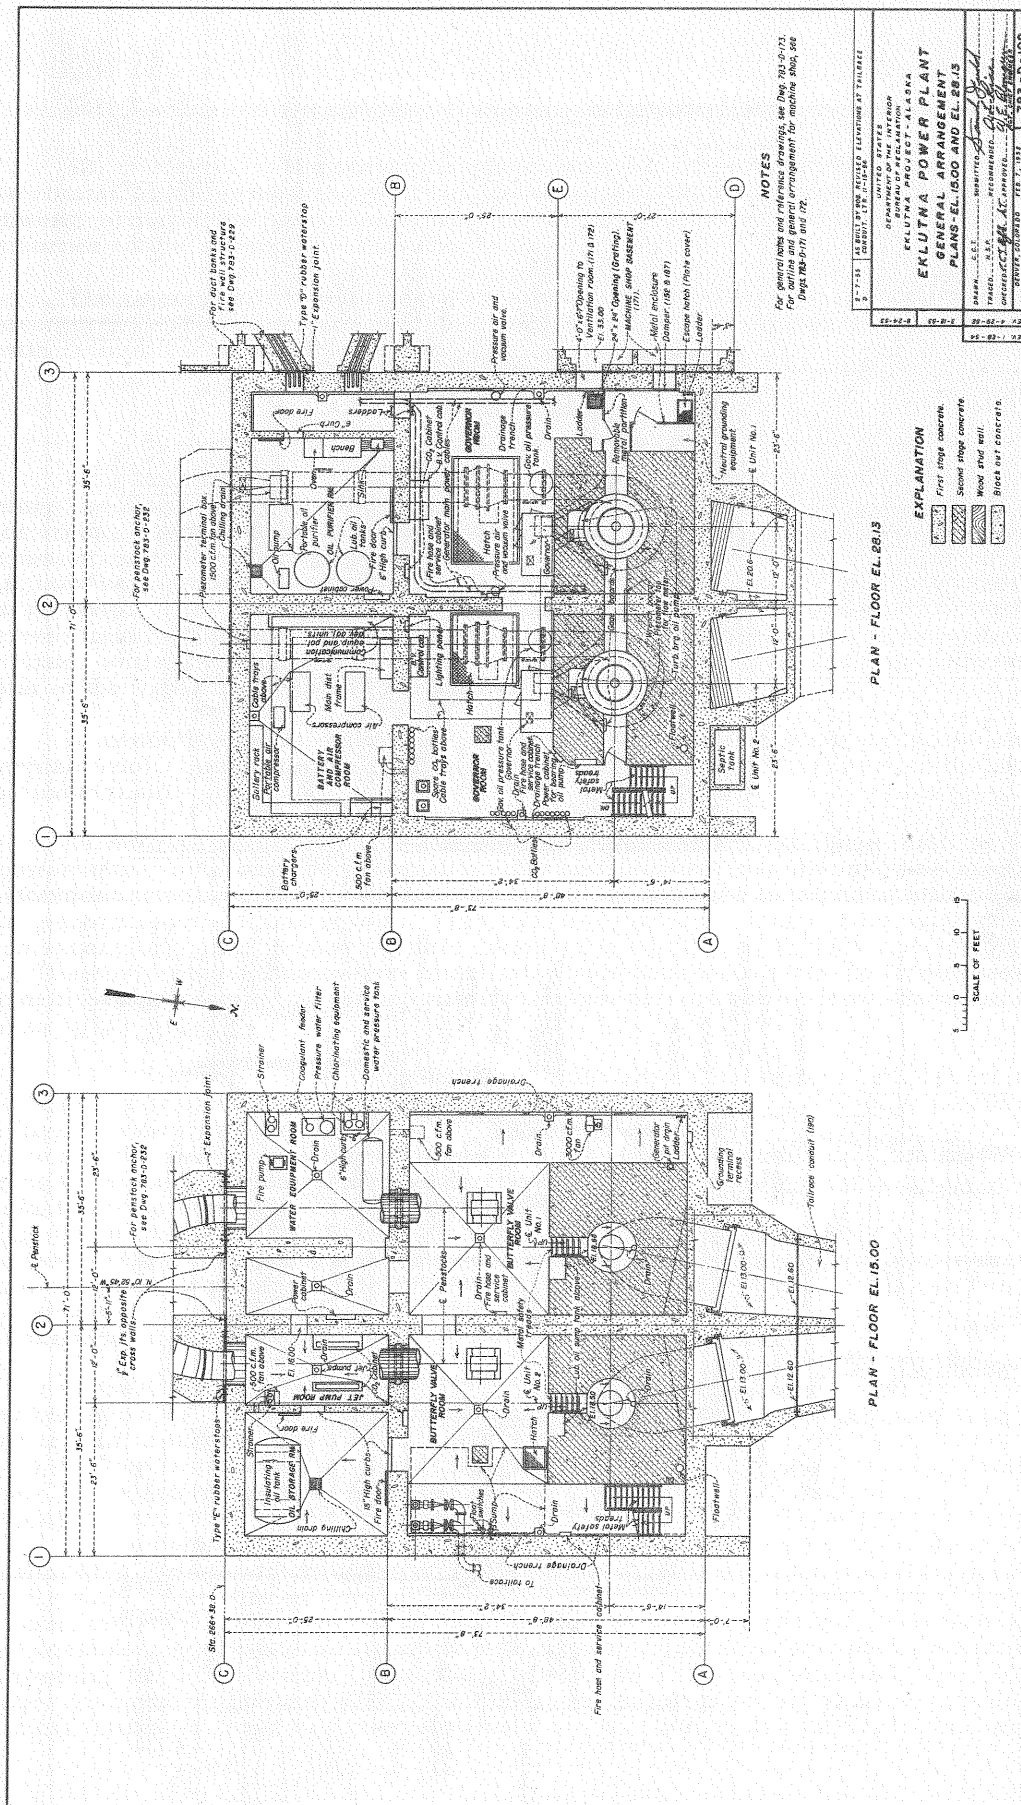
General arrangement of powerplant at elevations 15.00 and 28.13.
